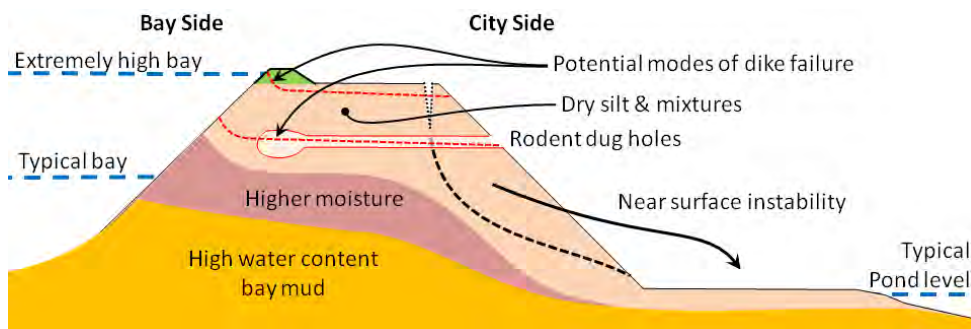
Hypothetical section showing soil moisture contents, near surface instability, and rodent dug holes, and potential modes of failure.
